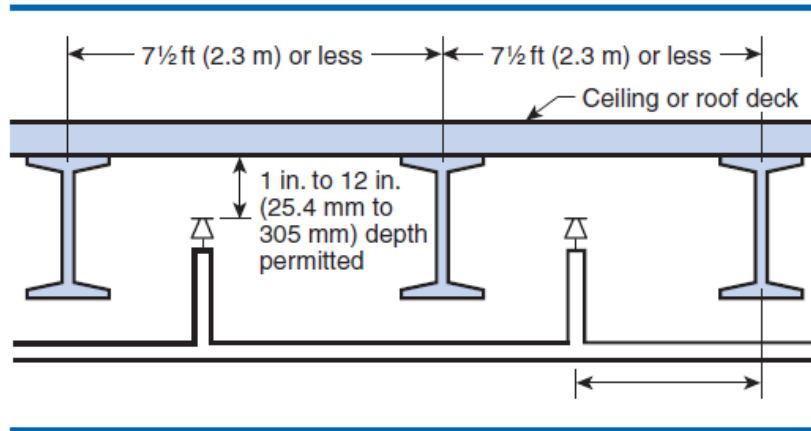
Placement of Standard Spray Upright Sprinklers Underneath Obstructed Construction with Sprinkler Deflector Positioned Above Bottom of Structural Member.
